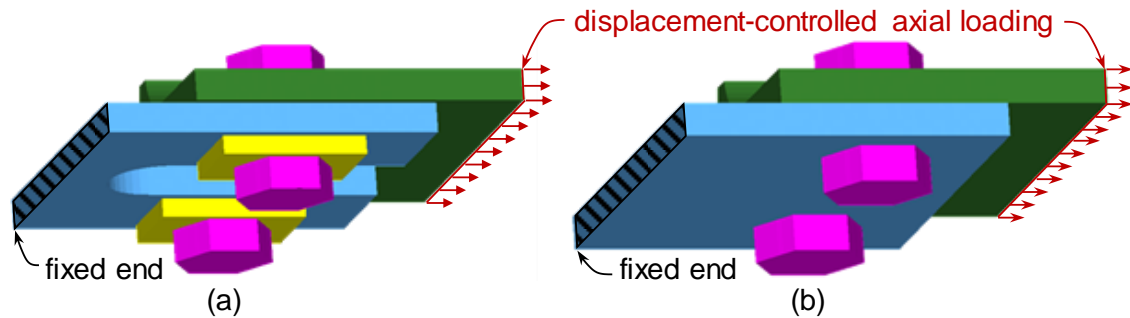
Component-level analysis models: (a) U-shaped plate with long-slotted holes; (b) rectangular plate with standard holes.
